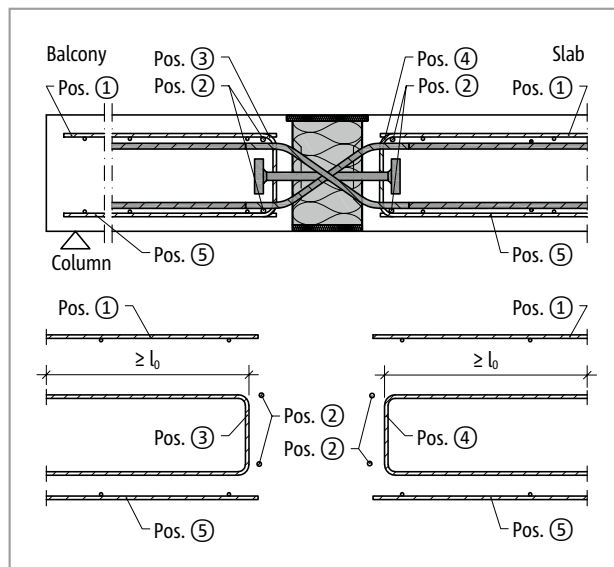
Schöck Isokorb® XT type Q-P-VV: On-site reinforcement
